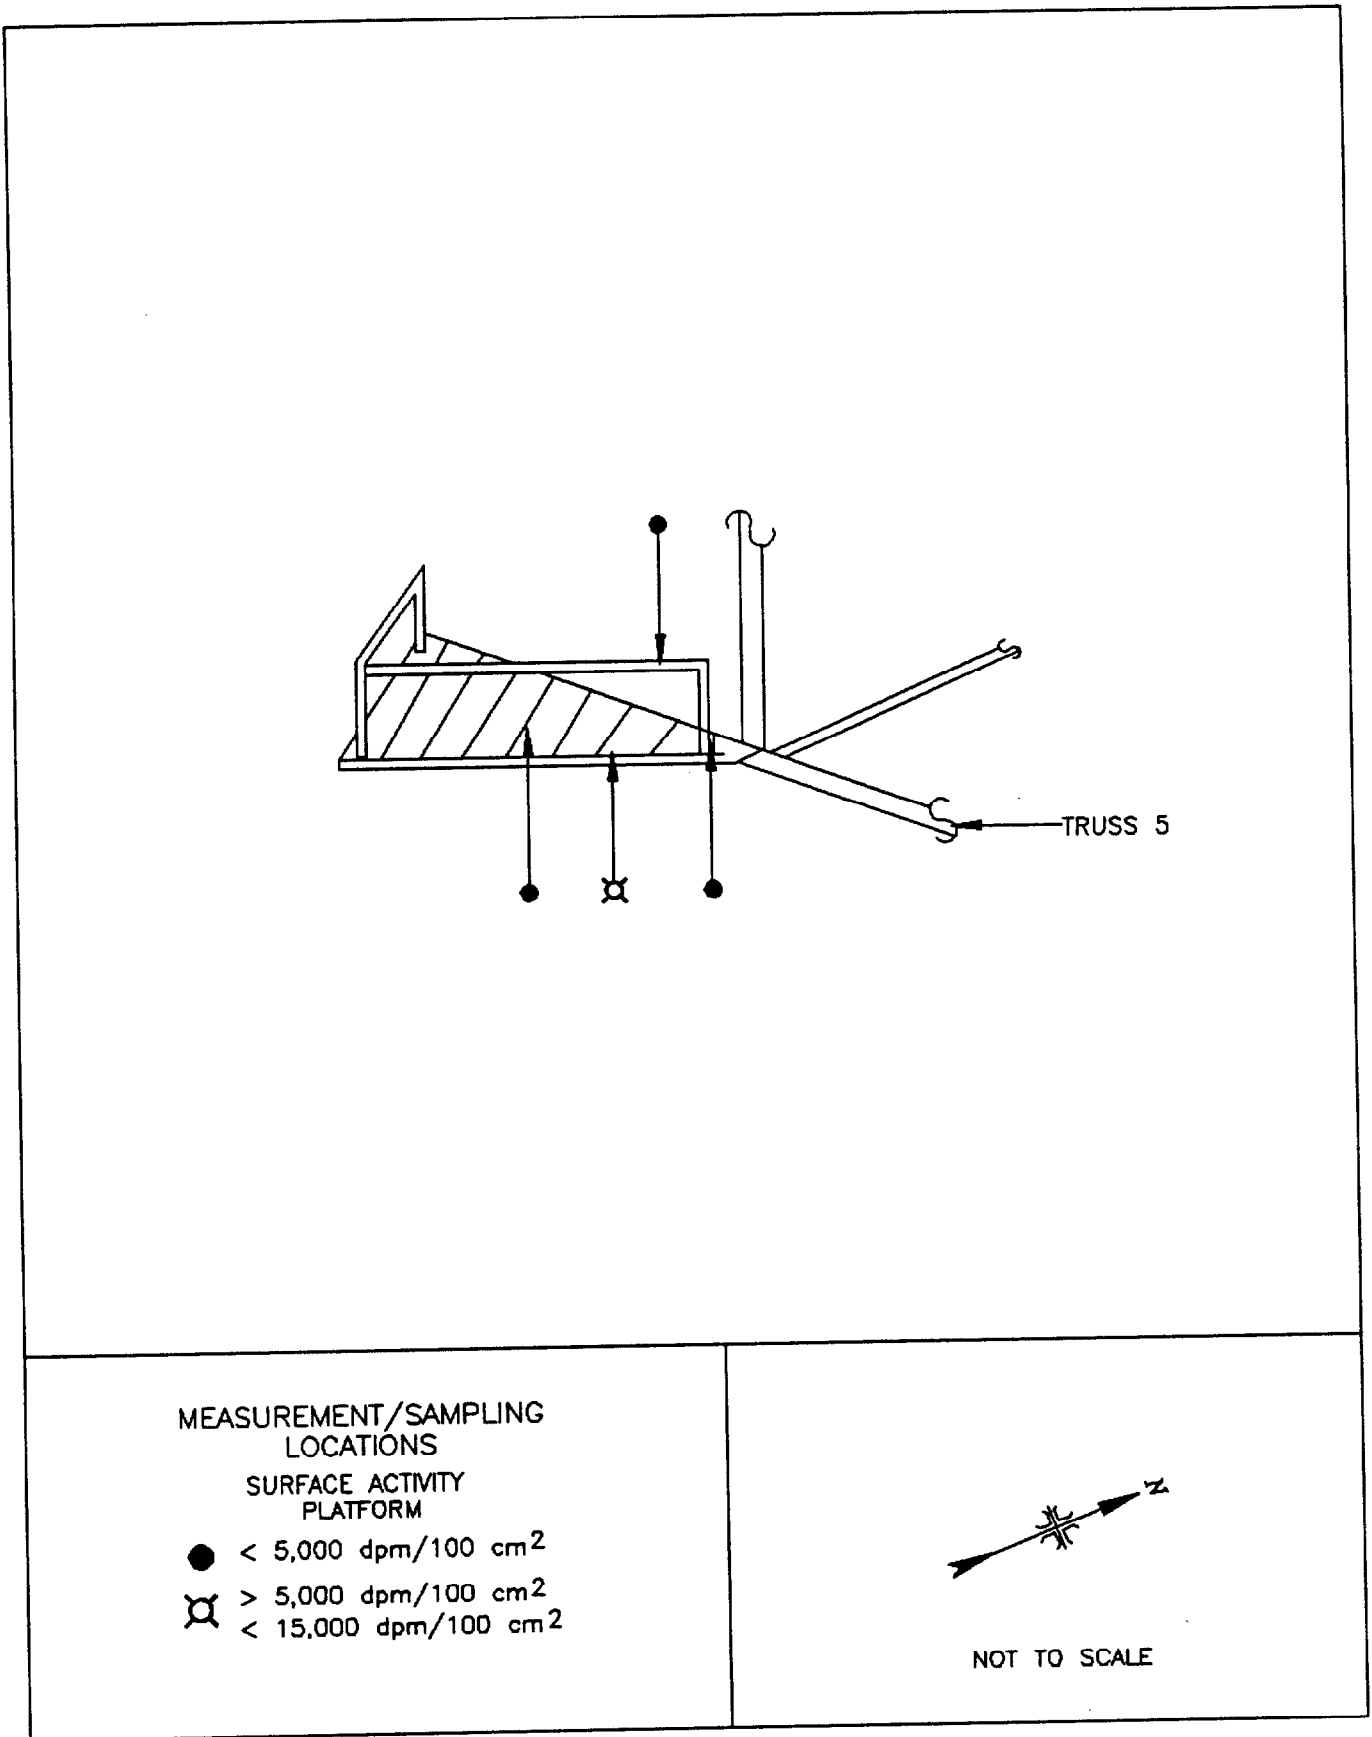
Building 8, Truss 5 Platform – Measurement and Sampling Locations
